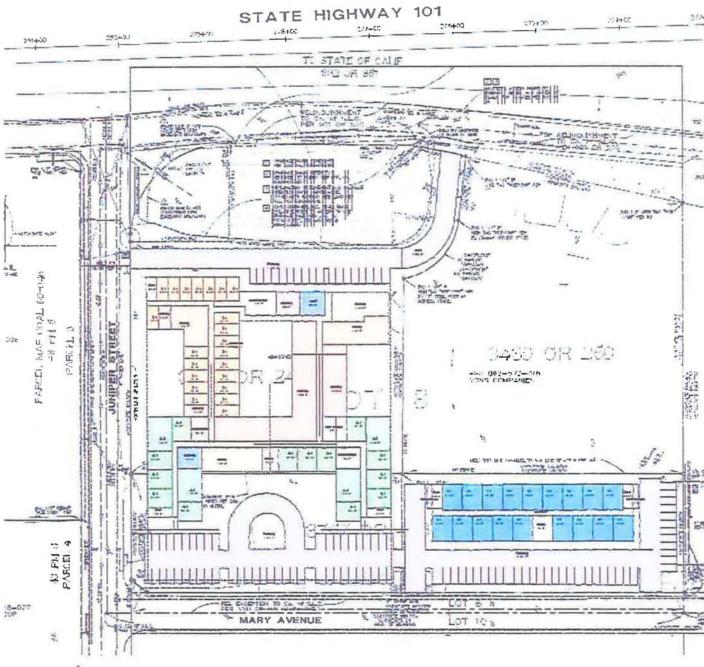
Site Plan From: Todd Crandall < 1c650@sbculobal.nei>
